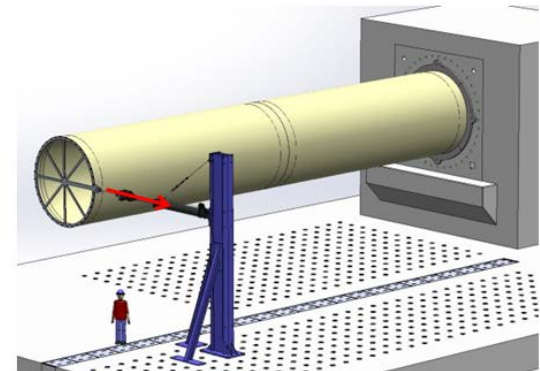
10ft diameter tower specimen undergoing thrust loading
